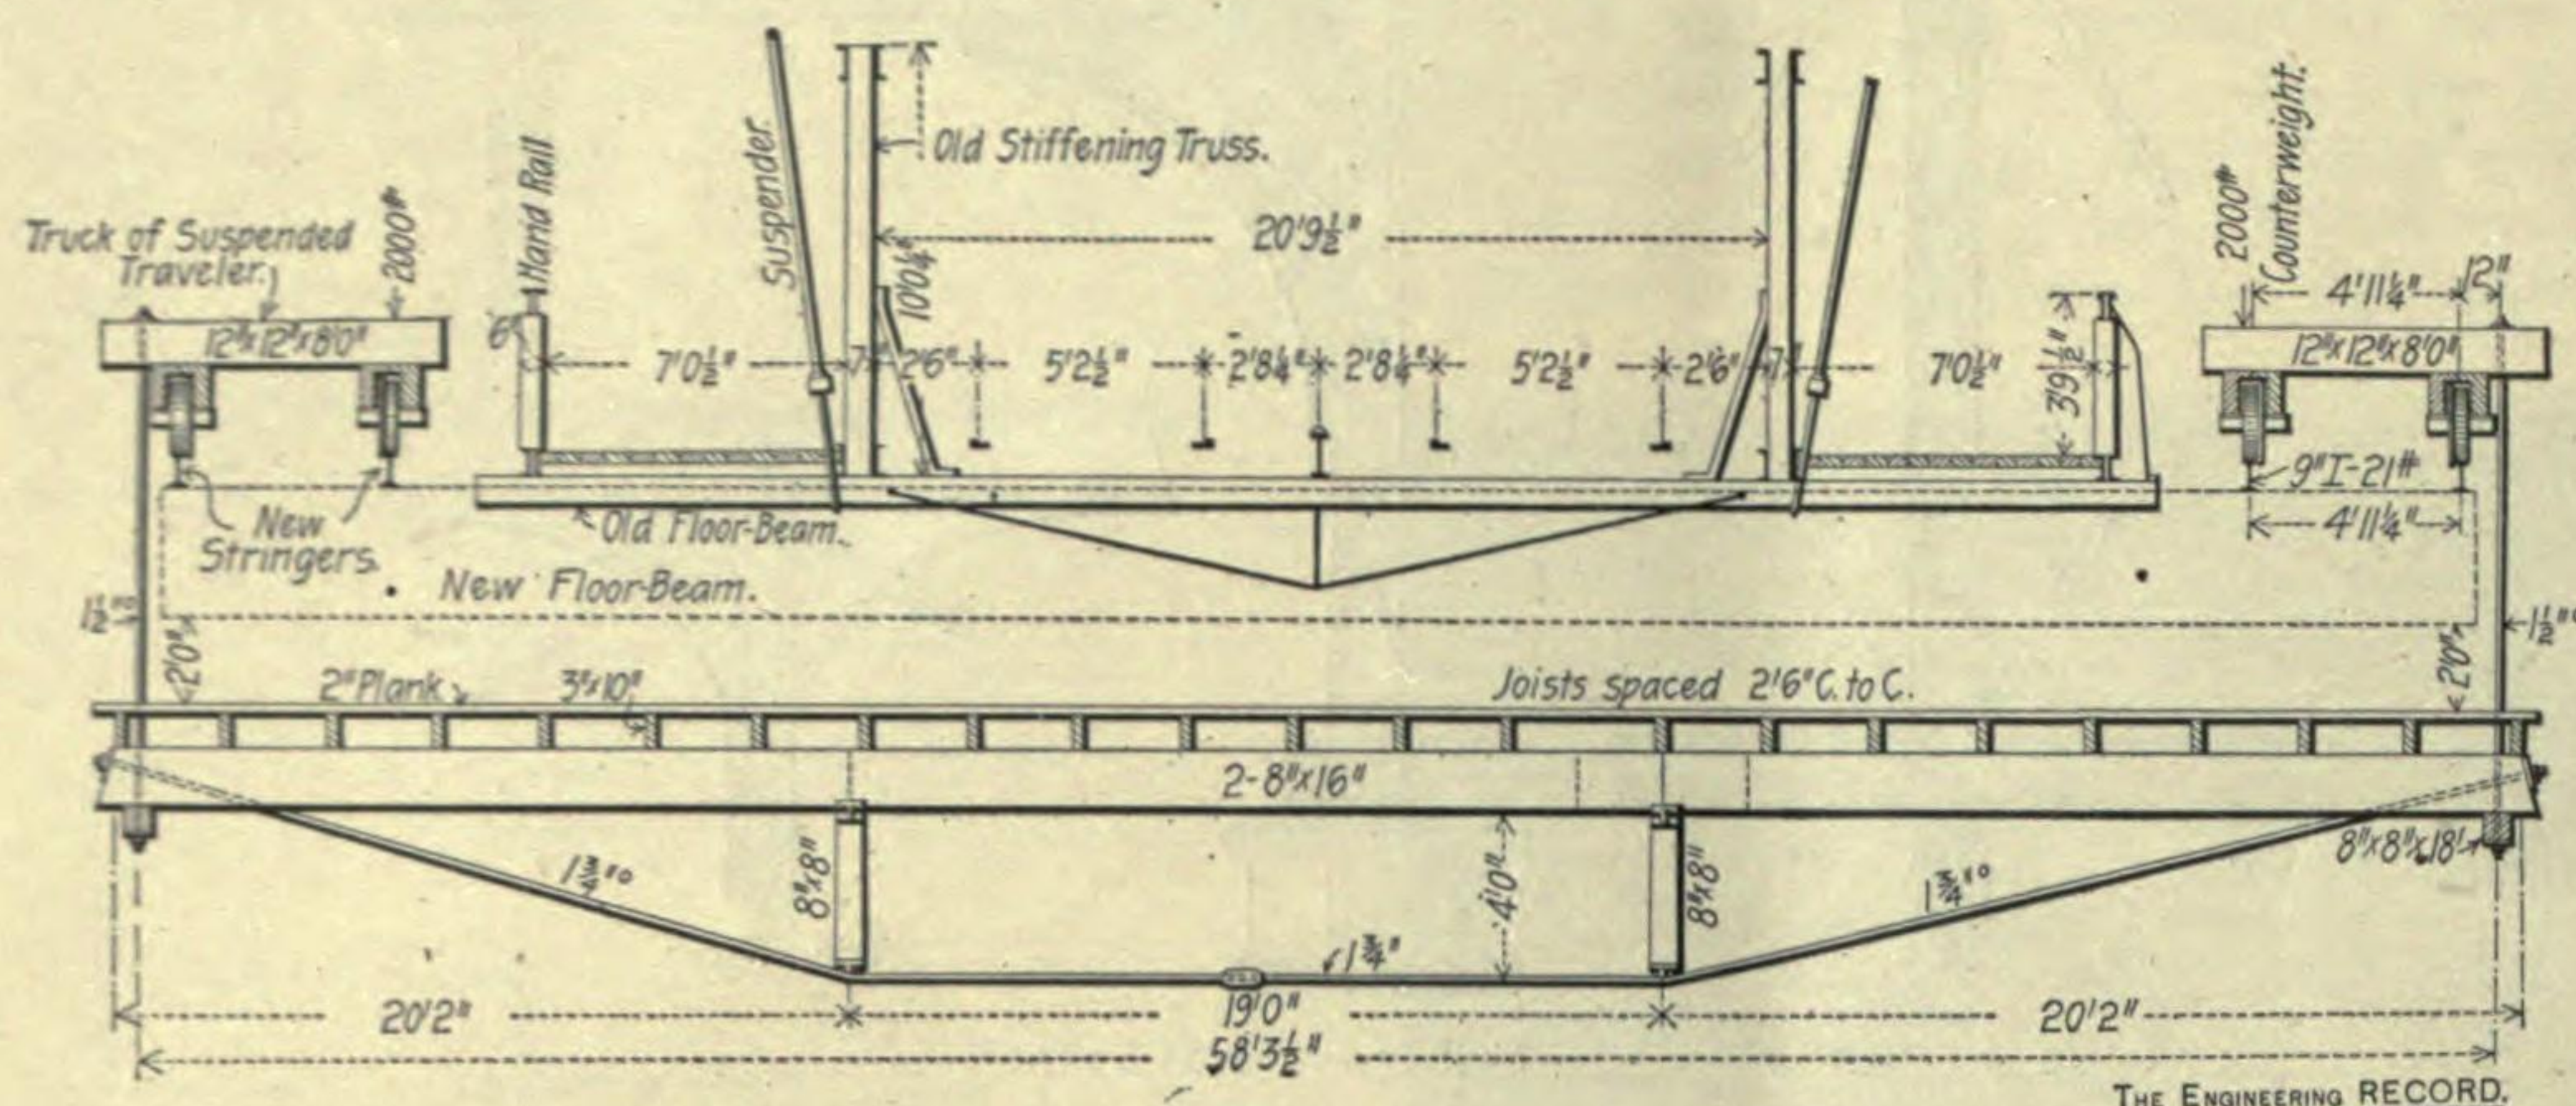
METHOD OF ERECTING FLOOR BEAMS.
